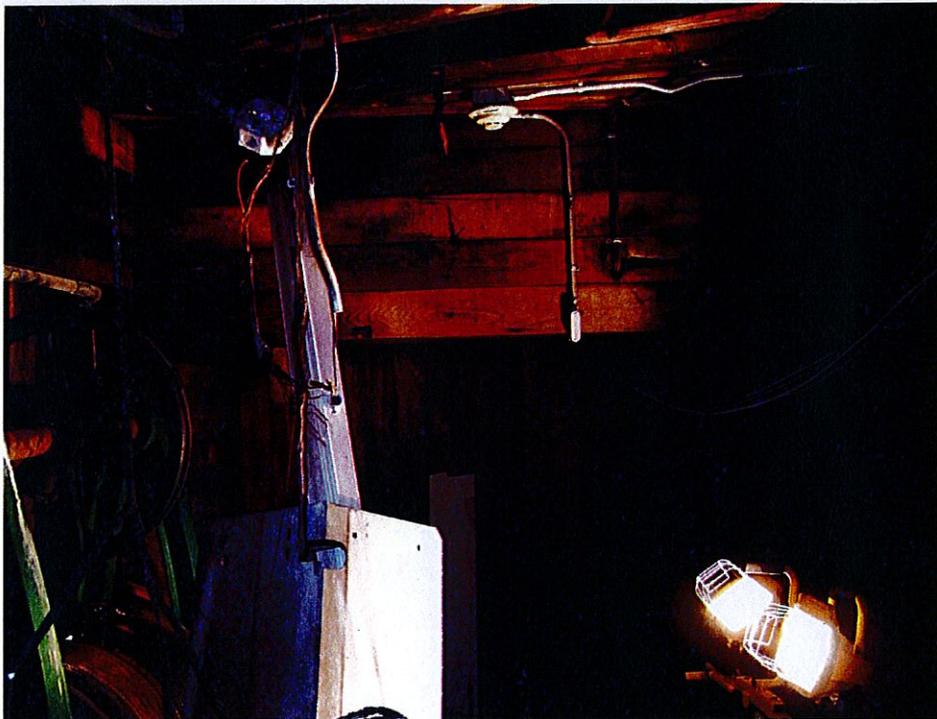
Image 52 (file DSCF0406.jpg). The ceiling of the elevator machine room looking towards the east wall. The fire alarm heat detector can be seen mounted on the ceiling. Much of the ceiling is intact and unburned. Ceiling areas that are burned through on the left show much more significant damage to the top surfaces of the ceiling boards, suggesting that fire development was greater and/or earlier in the space above the ceiling.
